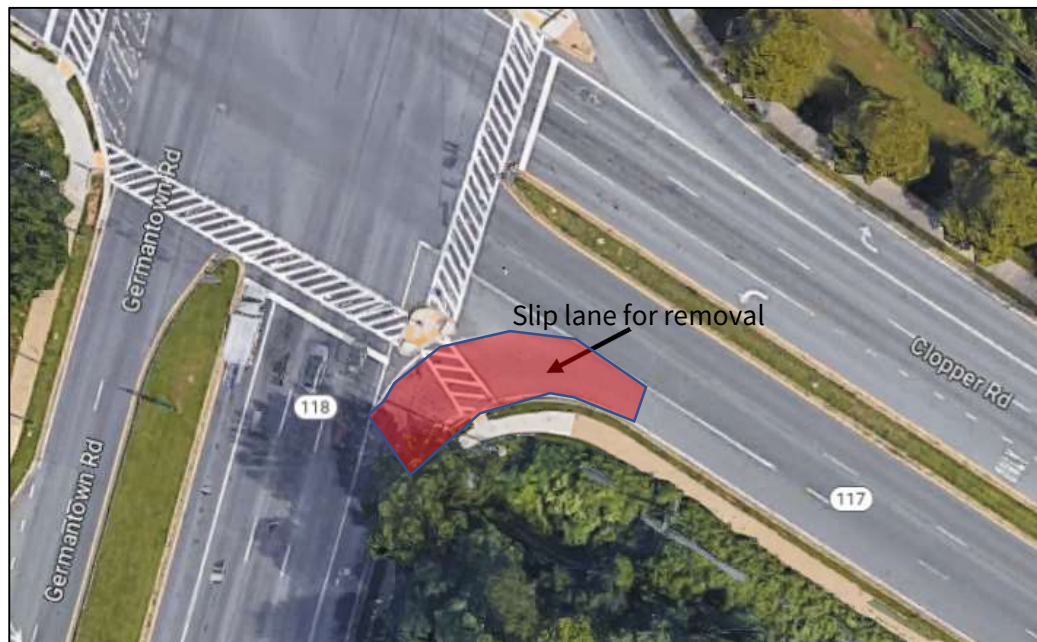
Existing Slip Lane (orange) to Be Removed at Germantown Road and Clopper Road
